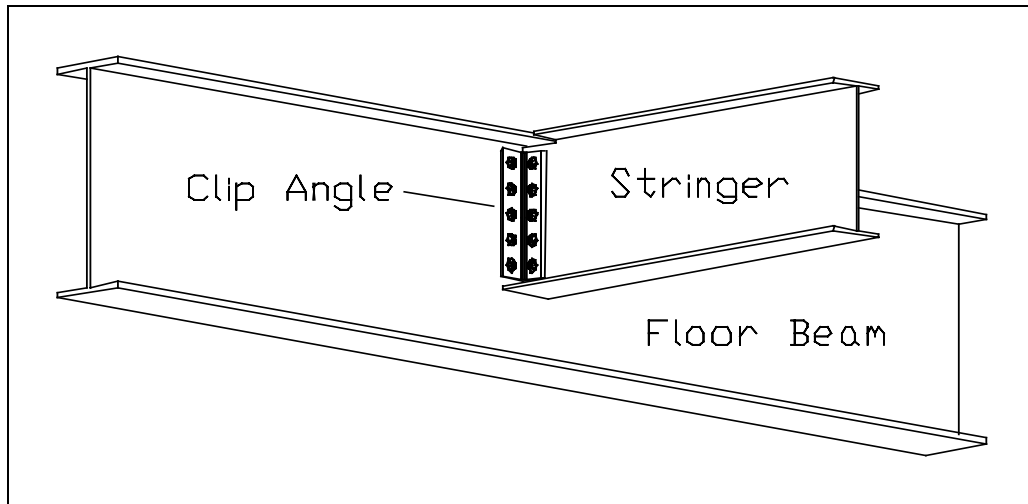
Typical stringer - to - floor beam connection detail assembly
